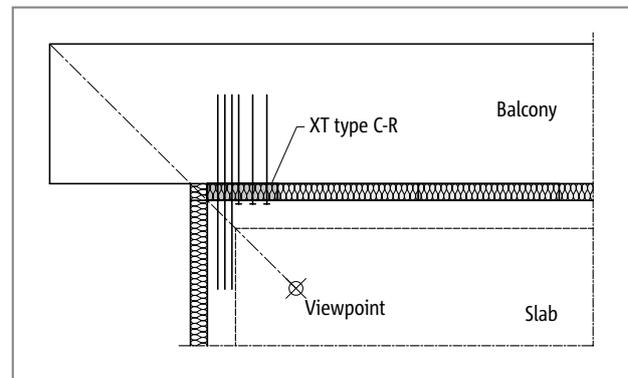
Schöck Isokorb® XT type C: Balcony projecting over corner of building (application XT type C-R)
